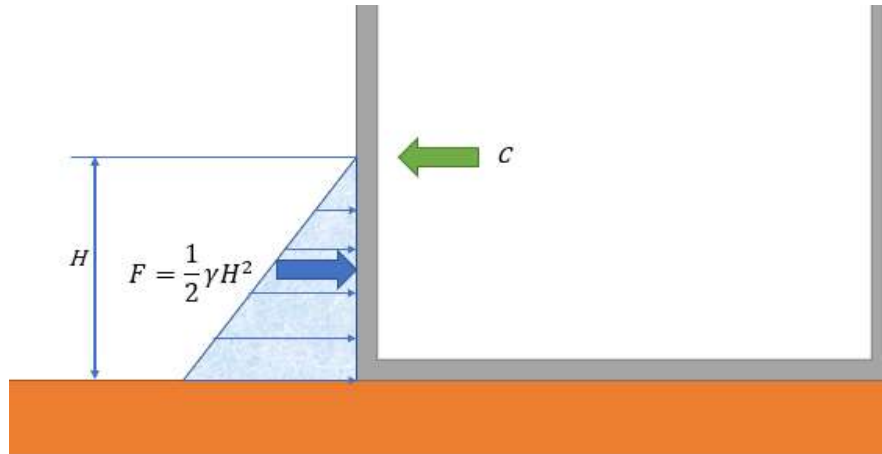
Scheme of hydrostatic pressure of water on external walls
